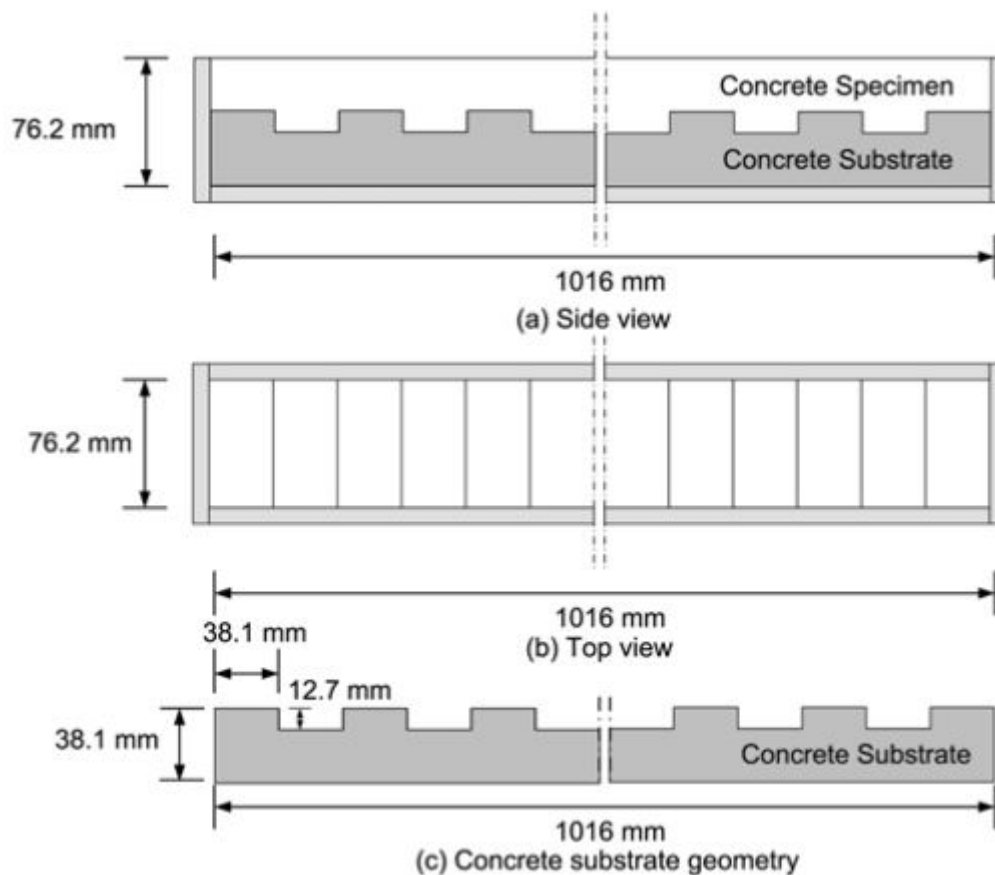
Schematic of plastic shrinkage cracking test setup: a) side view; b) top view; and c) concrete substrate geometry [50].
